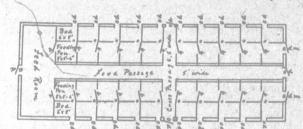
A design for a large piggery. A new building could be erected on a smaller scale. That is, with less length.
